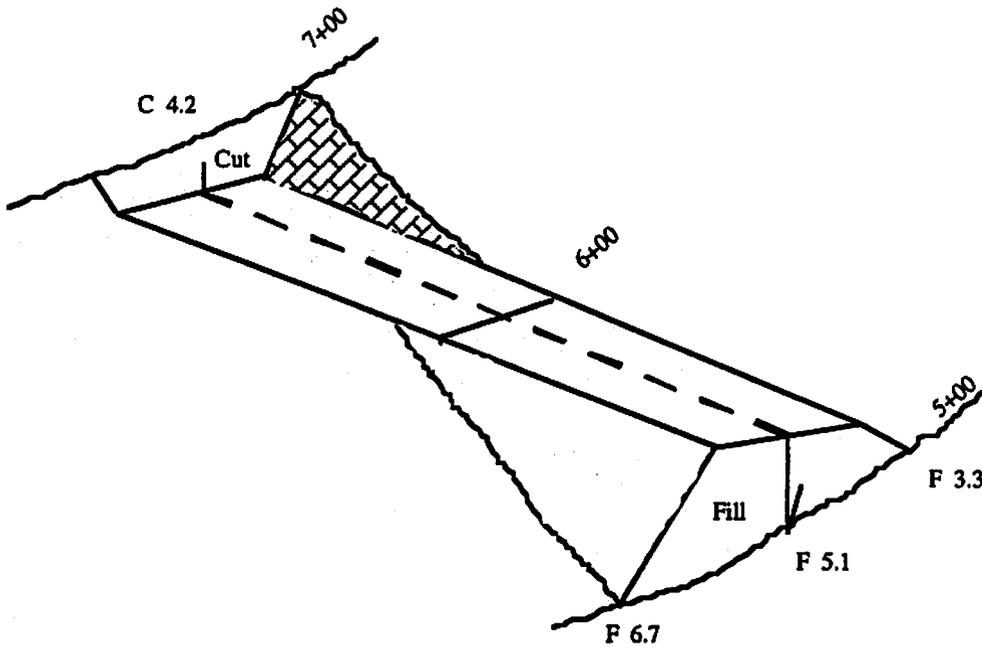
Schematic of earthworks (adapted from Walbridge et al. 1984)
